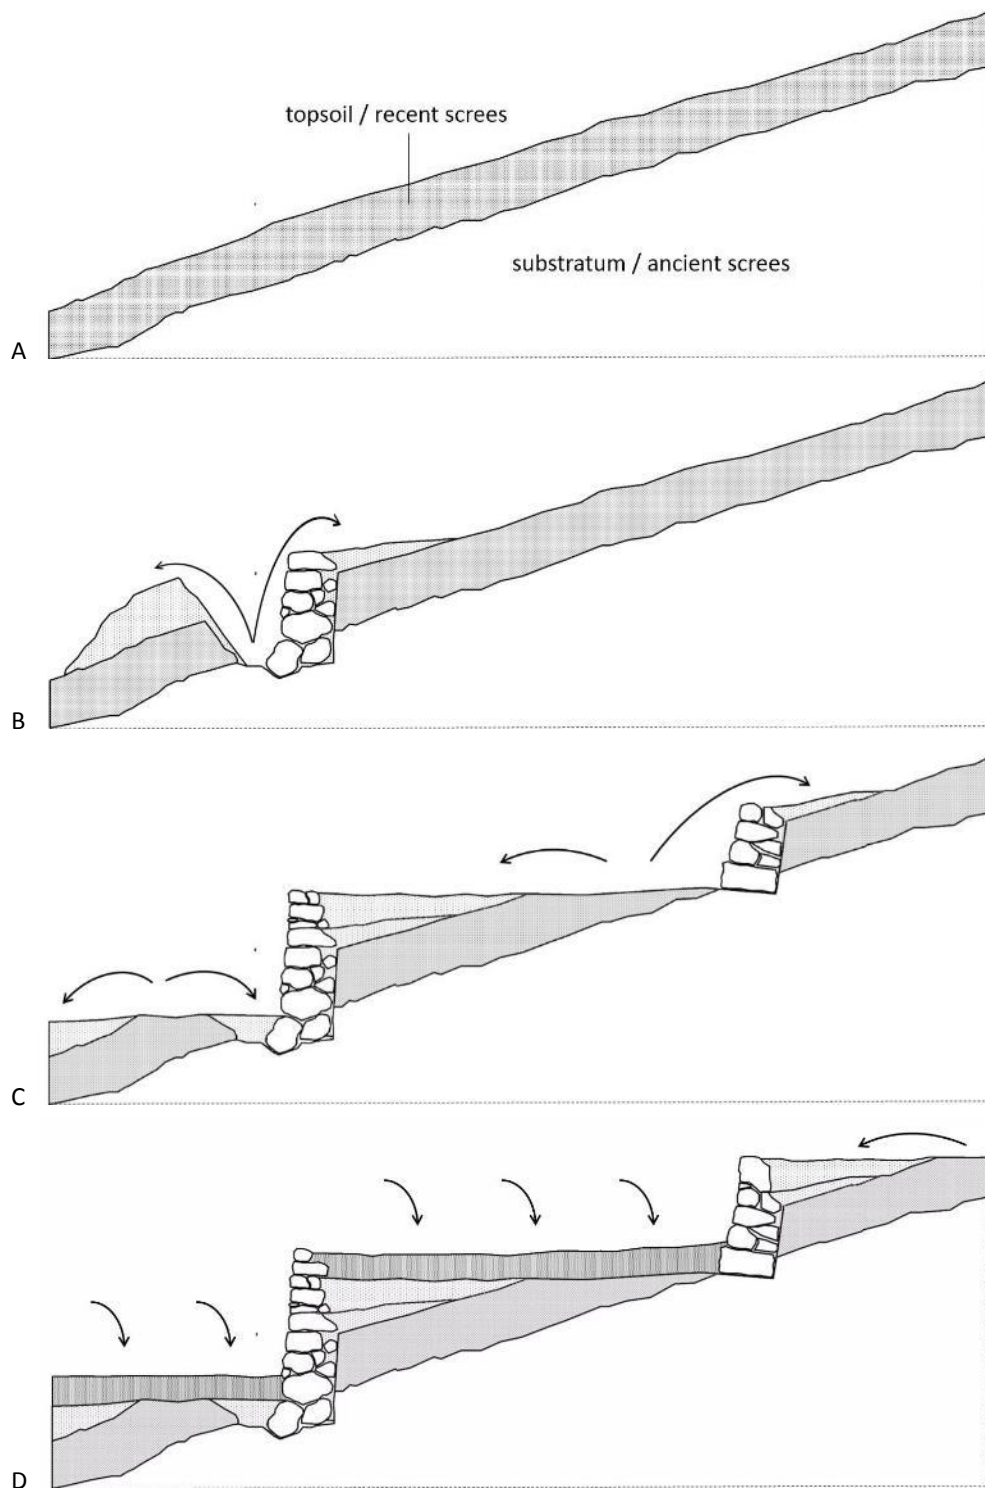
Schematic reconstruction of the layout of the terracing system at site F. The foundation trenches for the terrace walls were cut through the topsoil and (partially) into the natural substratum, which consists mainly of fossilised screes (A). Unworked field stones, collected from the surface and/or the foundation trench, are used to erect the retaining terrace walls (B). The surplus of soil/rock is subsequently used to backfill the trench behind the wall and to start levelling the terrain. Whether there is an actual foundation trench along the front of the wall depends on the applied construction techniques (C). In order to create fertile, arable lands, additional soil might have been imported (D).³¹³
